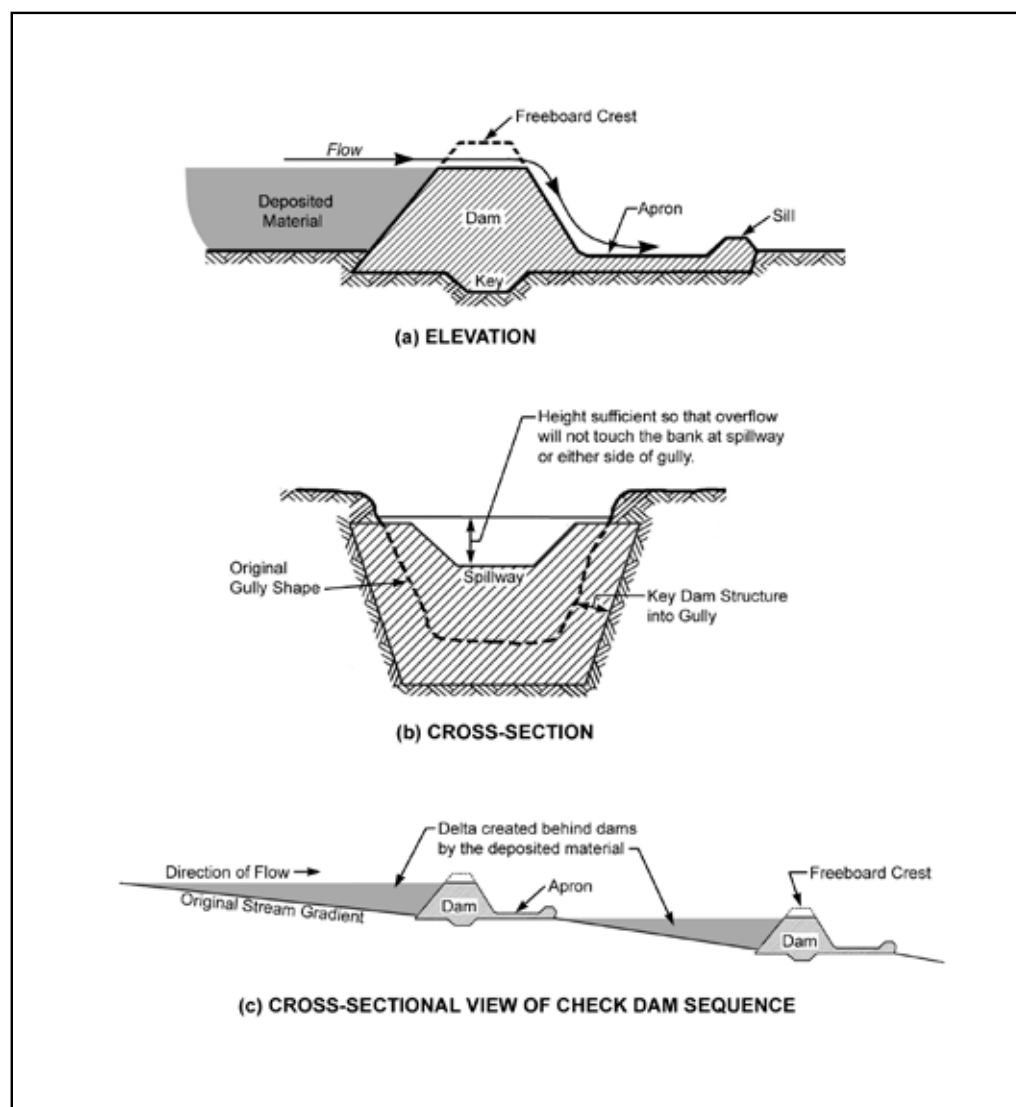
Check dams used to control or stabilize a gully. Note the details for keying the structure into the gully, having a U-shaped weir, and protecting the toe area against scour and with other downslope structures.
